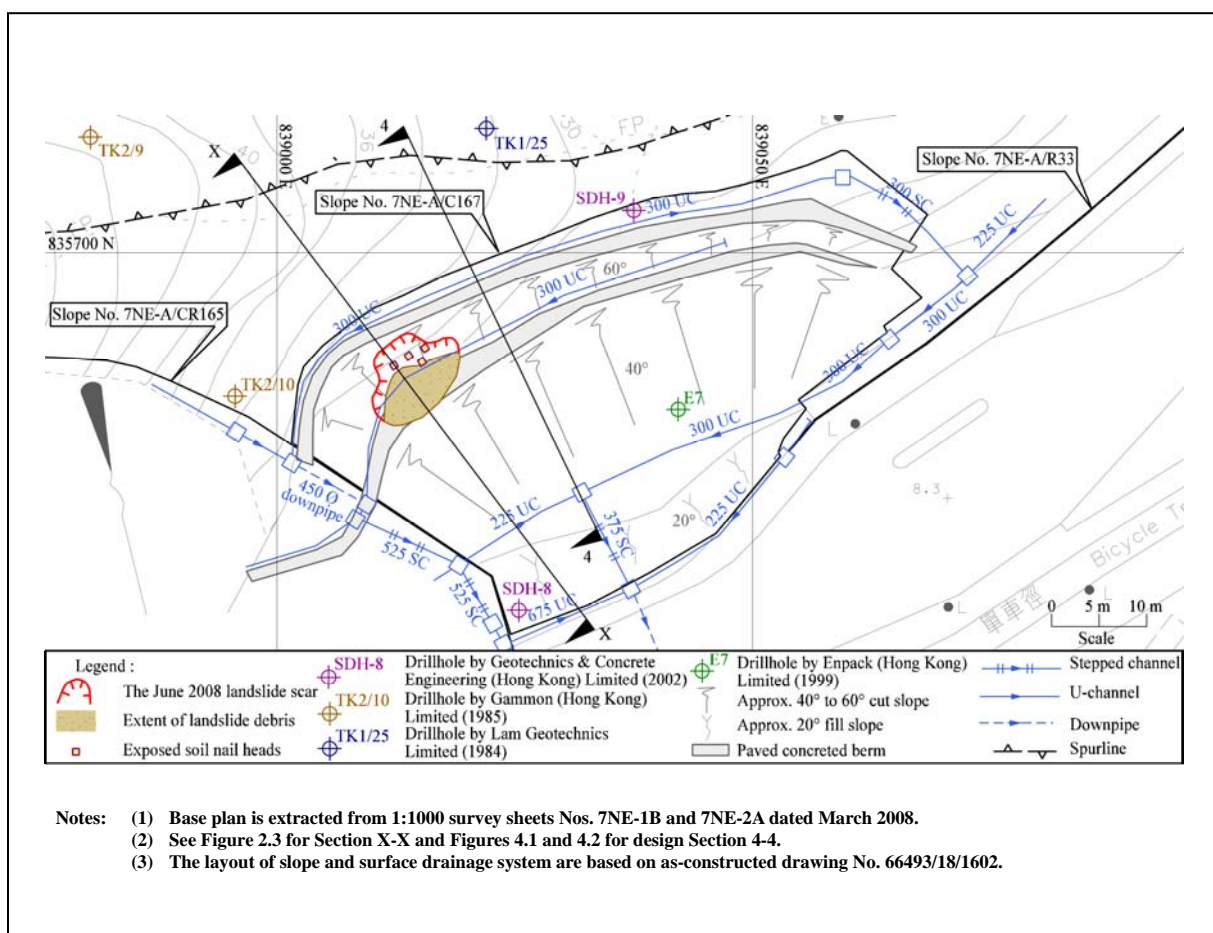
Layout Plan with As-constructed Drainage System and Ground Investigation Stations
